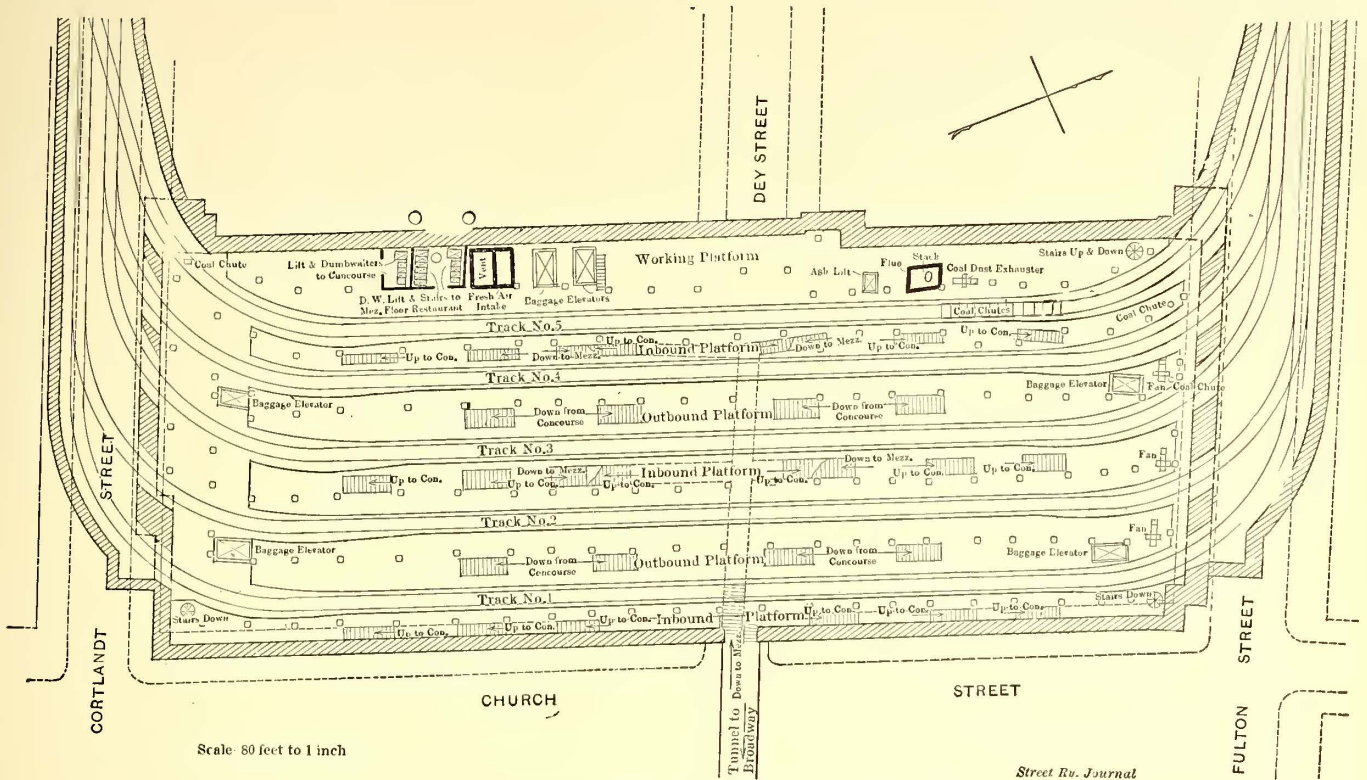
PLAN OF STATION AT CORTLANDT STREET
